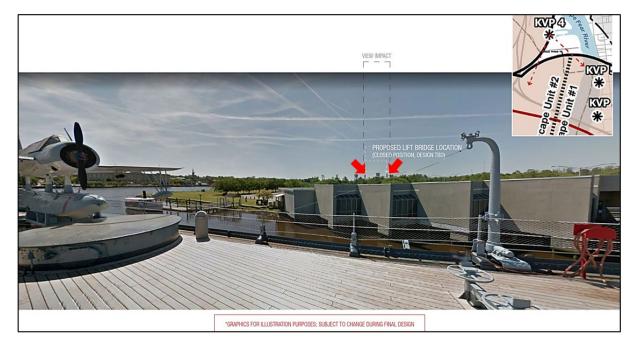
KVP 4[b] – Proposed view looking southeast across US North Carolina deck toward the Visitors Center and Cape Fear River with location of the towers of proposed rail bridge (see arrows) and larger adjacent Memorial Bridge towers at center distance.
